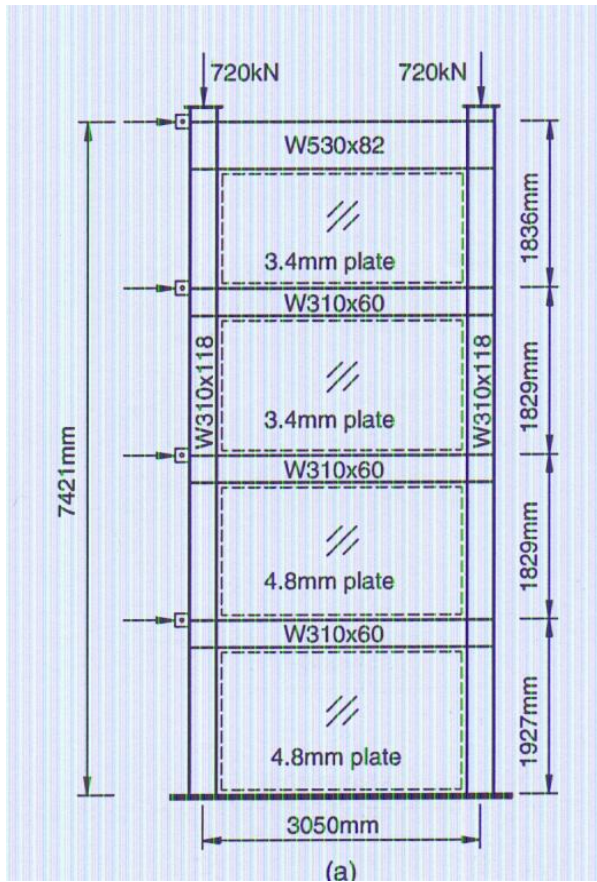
Steel Frame Associated with Steel Plate Shear Wall [20]
